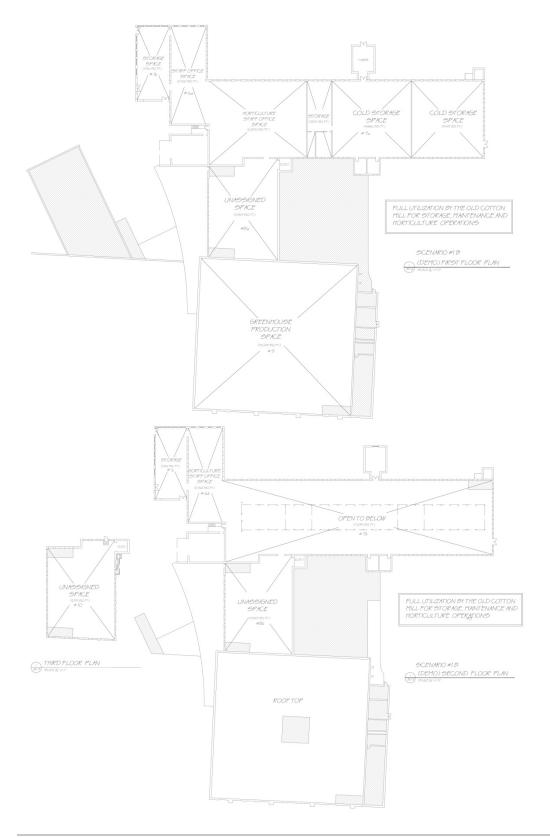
Horticulture operation - Option 1B Ground and Second Floor Plan
